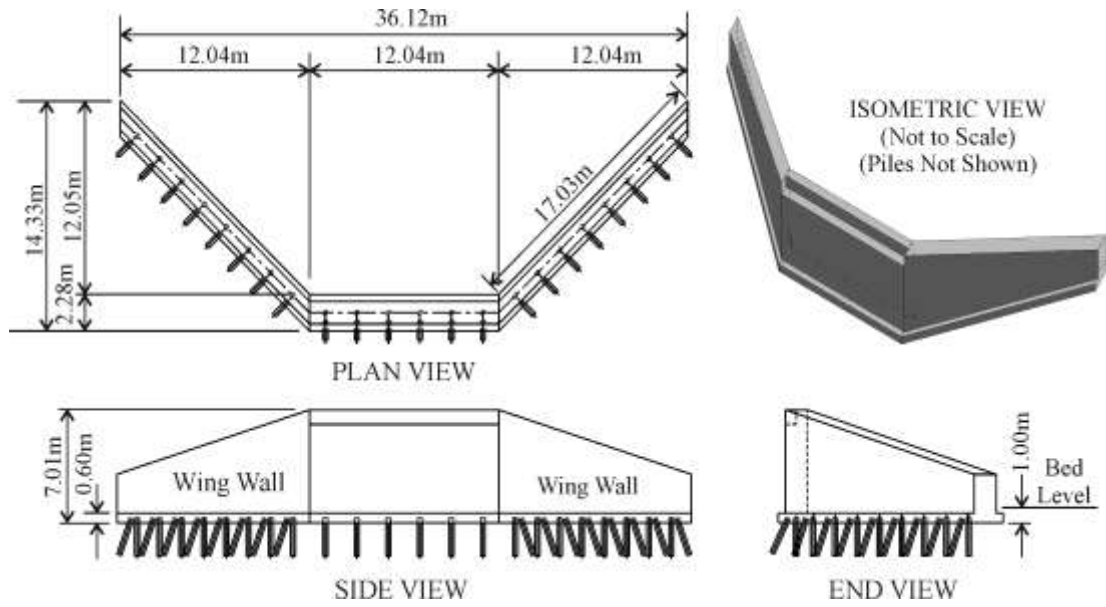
Prototype dimensions of a pile-supported wing-wall column for wing-wall abutments. The model-scale dimensions are 1/30<sup>th</sup> of these dimensions.
